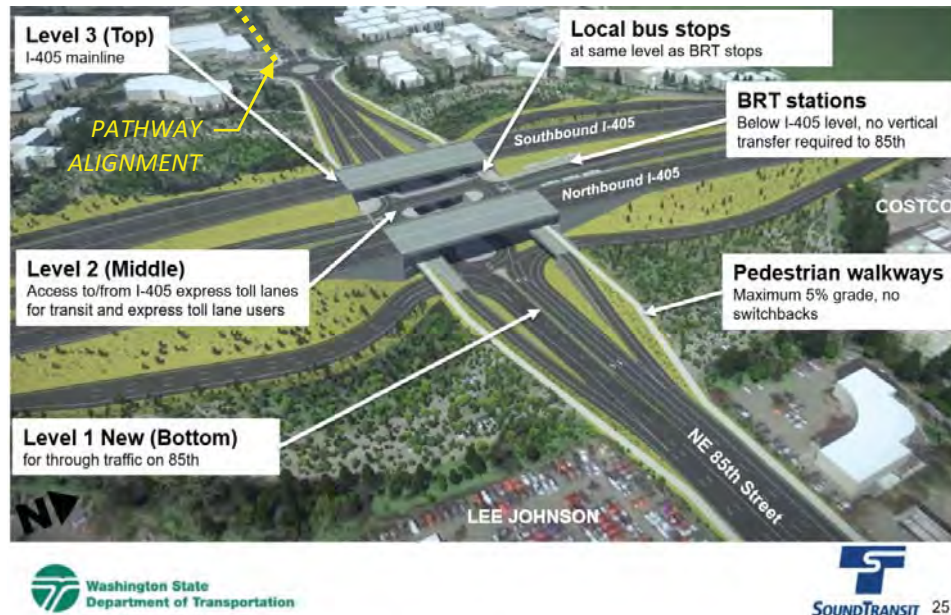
Figure – Future I-405 BRT Concept looking west towards the study site in yellow
